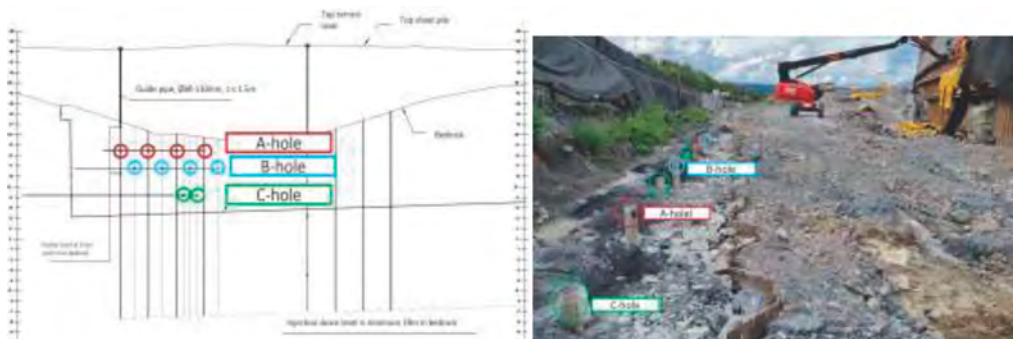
Illustration showing grouting holes with split-spacing procedure and photo of drilled casings for grout holes.
